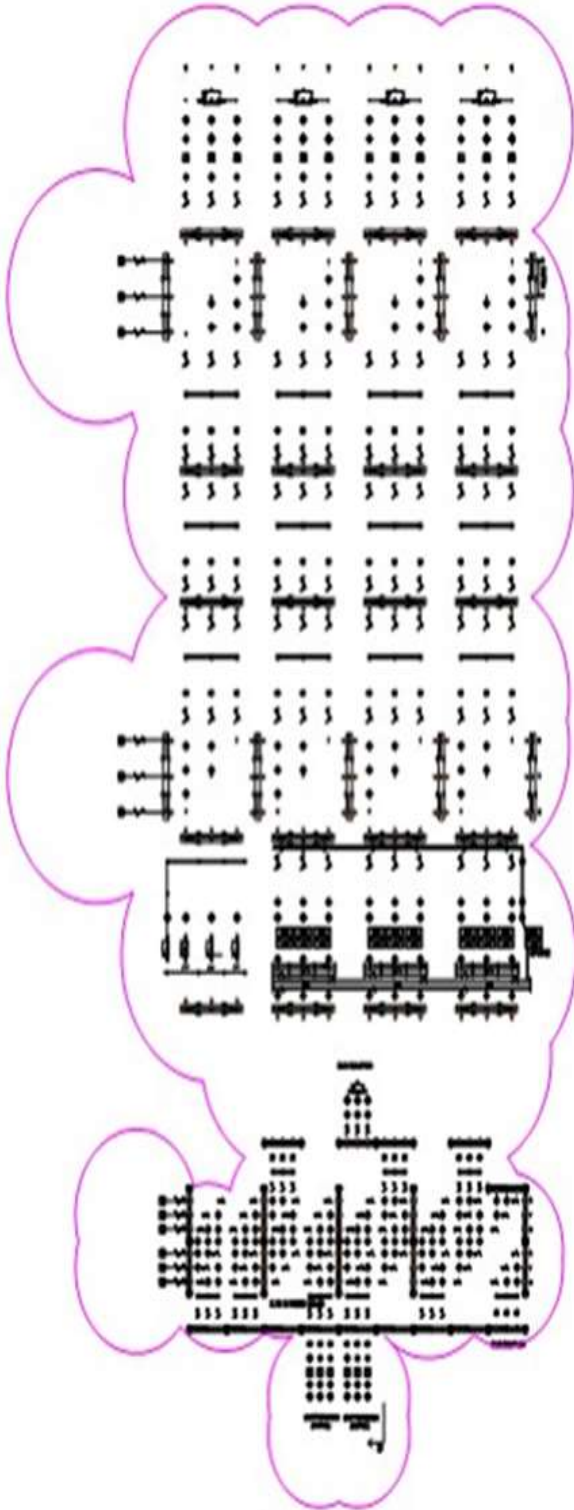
Plan Elevation of Protected Area for All Substation by Lightning Rod.
